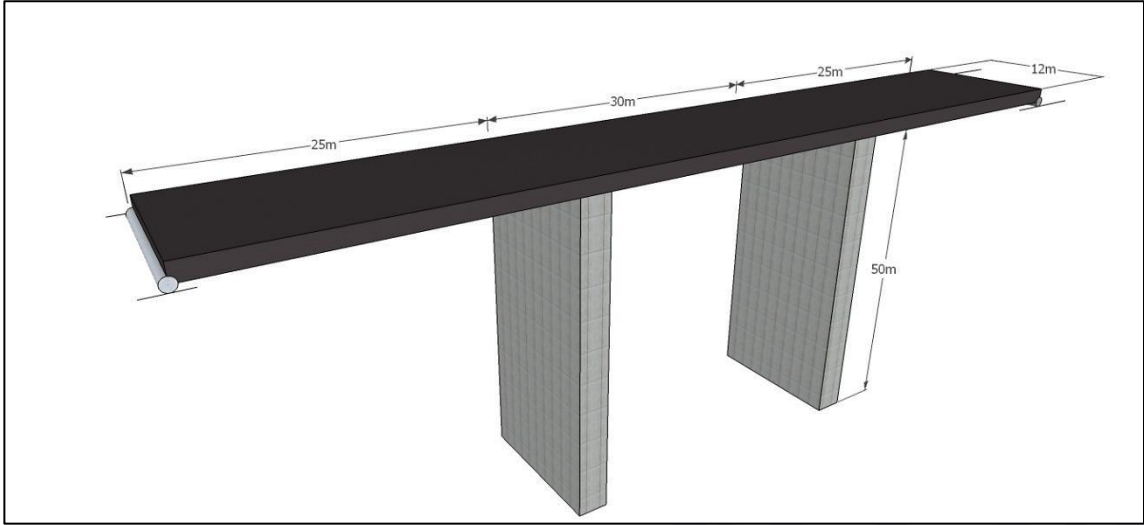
RC Bridge crossing Sungai Simpang Kiri dimension
